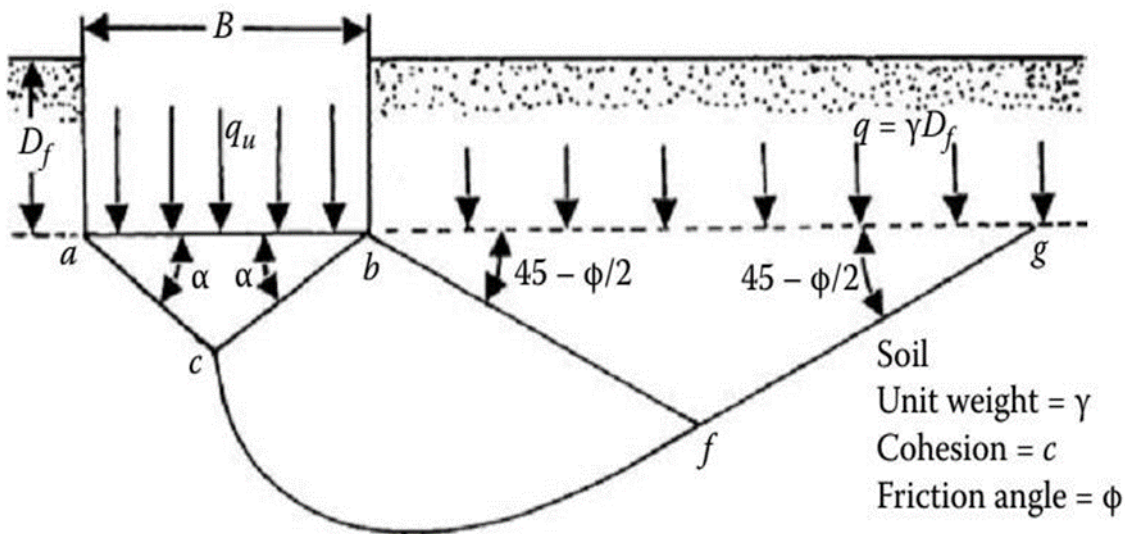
Soil failure surface under ultimate load of a rigid strip footing according to Terzaghi, (Das, 2021).
